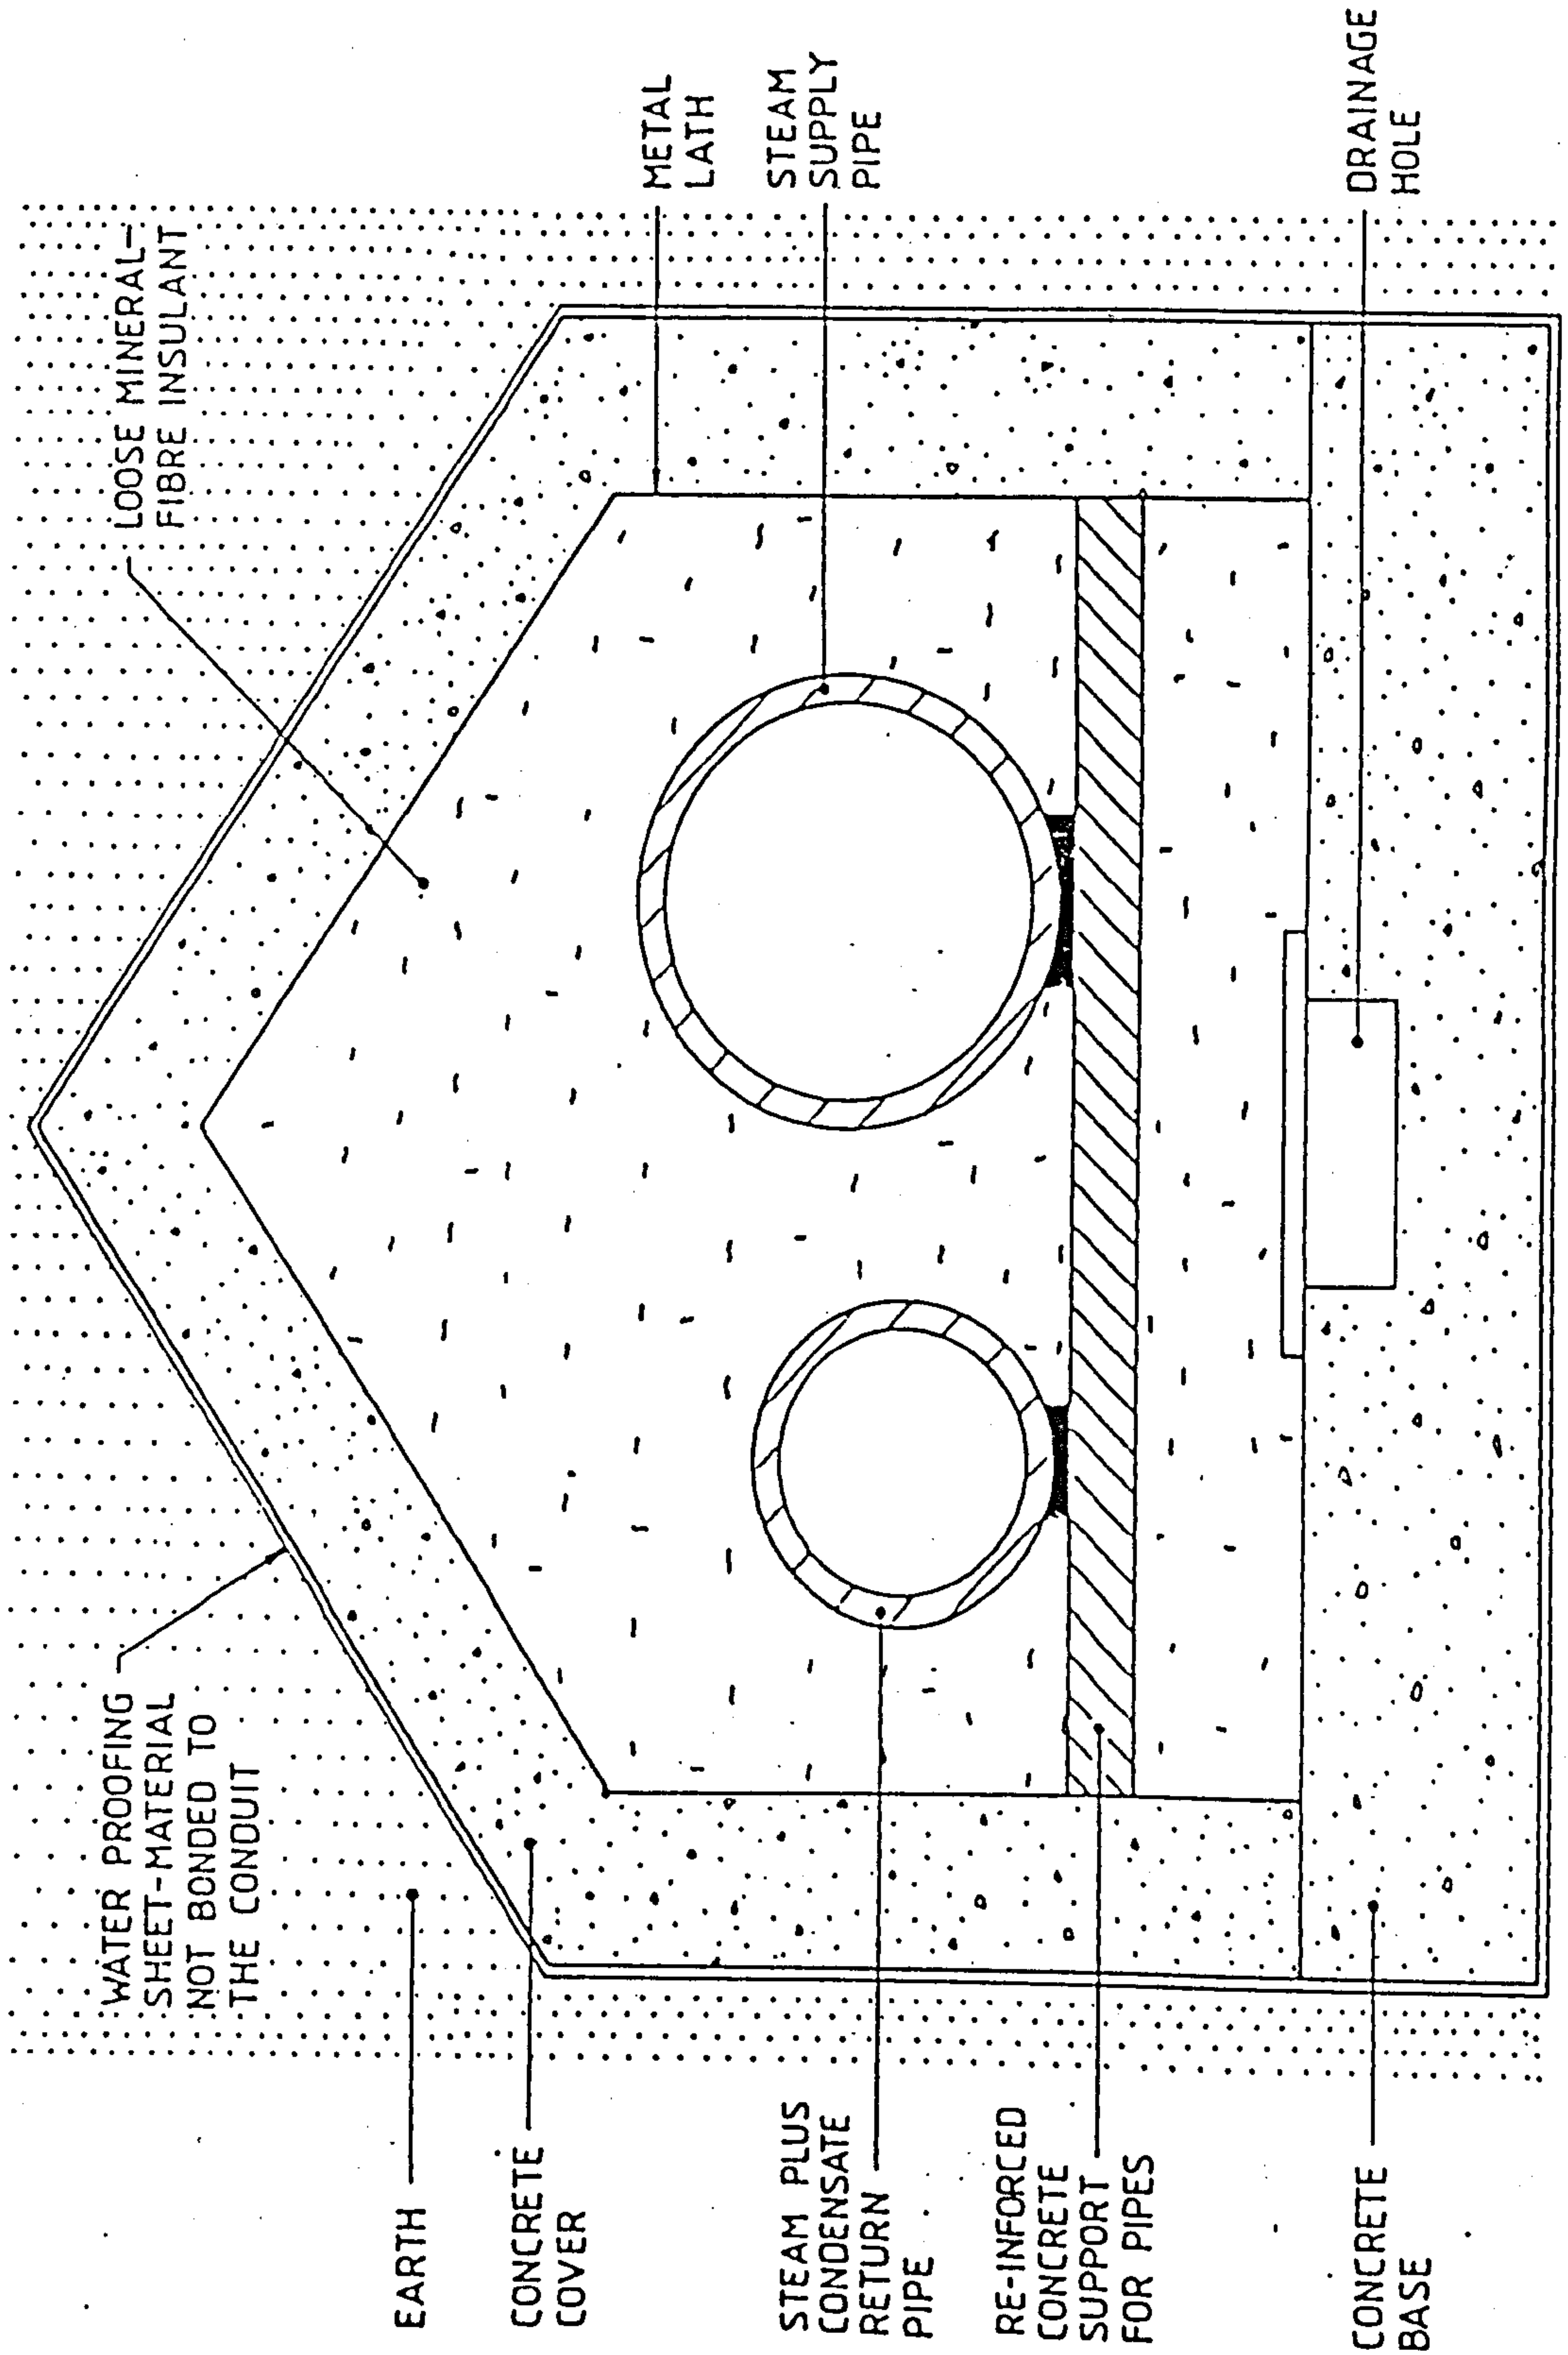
Schematic cross-section through a concrete conduit system for supply and return pipelines (60).
